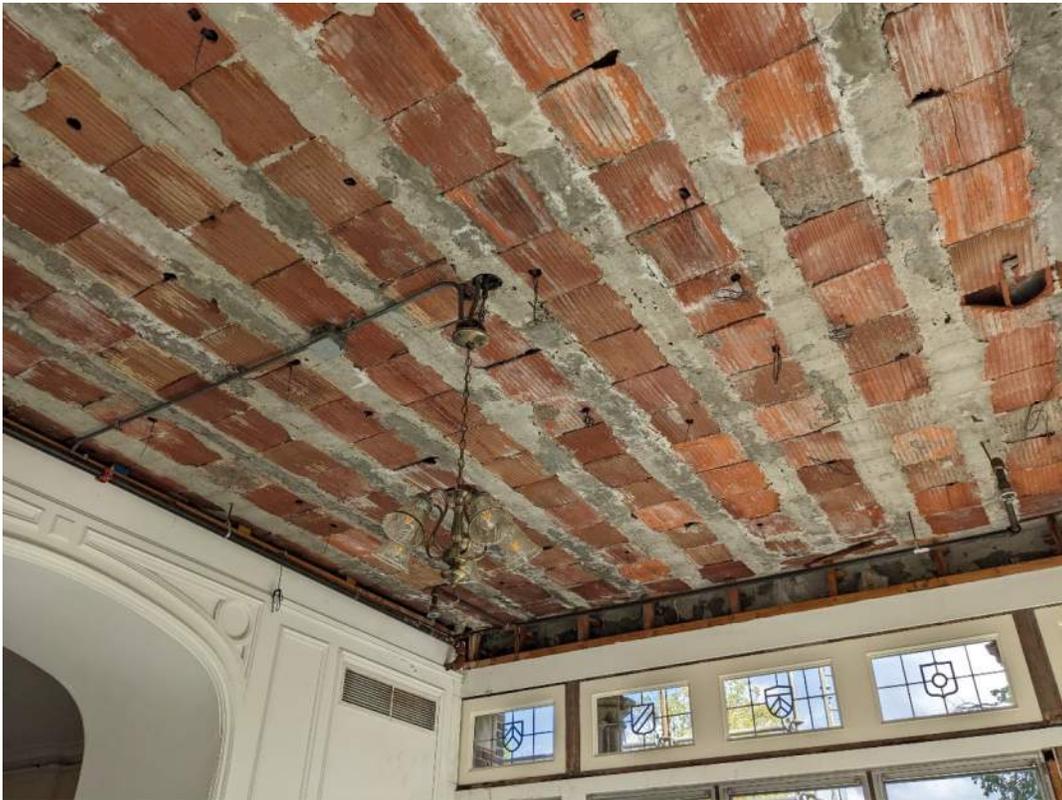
Mansion. Missing finish ceiling in Breakfast Porch.
